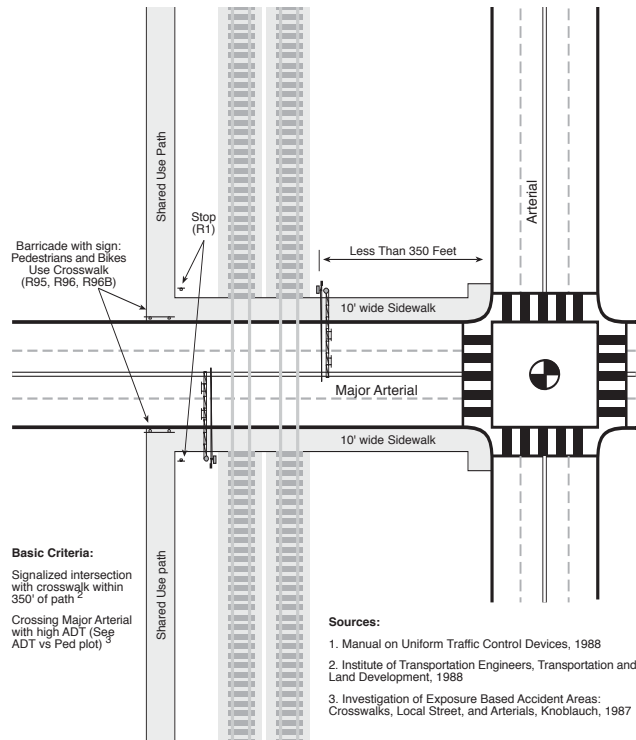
Roadway crossing type 1 (reroute to nearest intersection)
